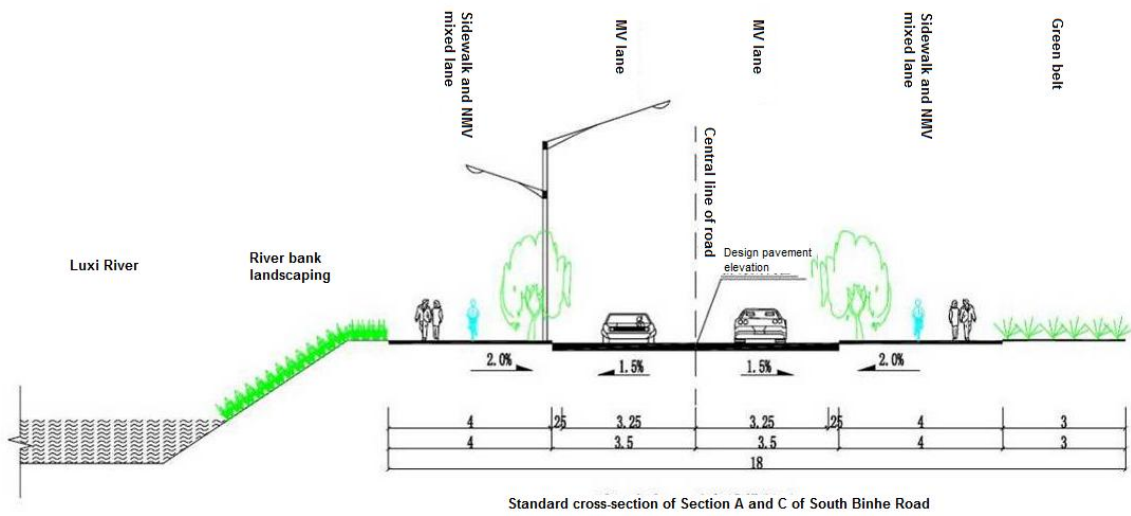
Cross-sectional Diagram of Urban Branch Road
